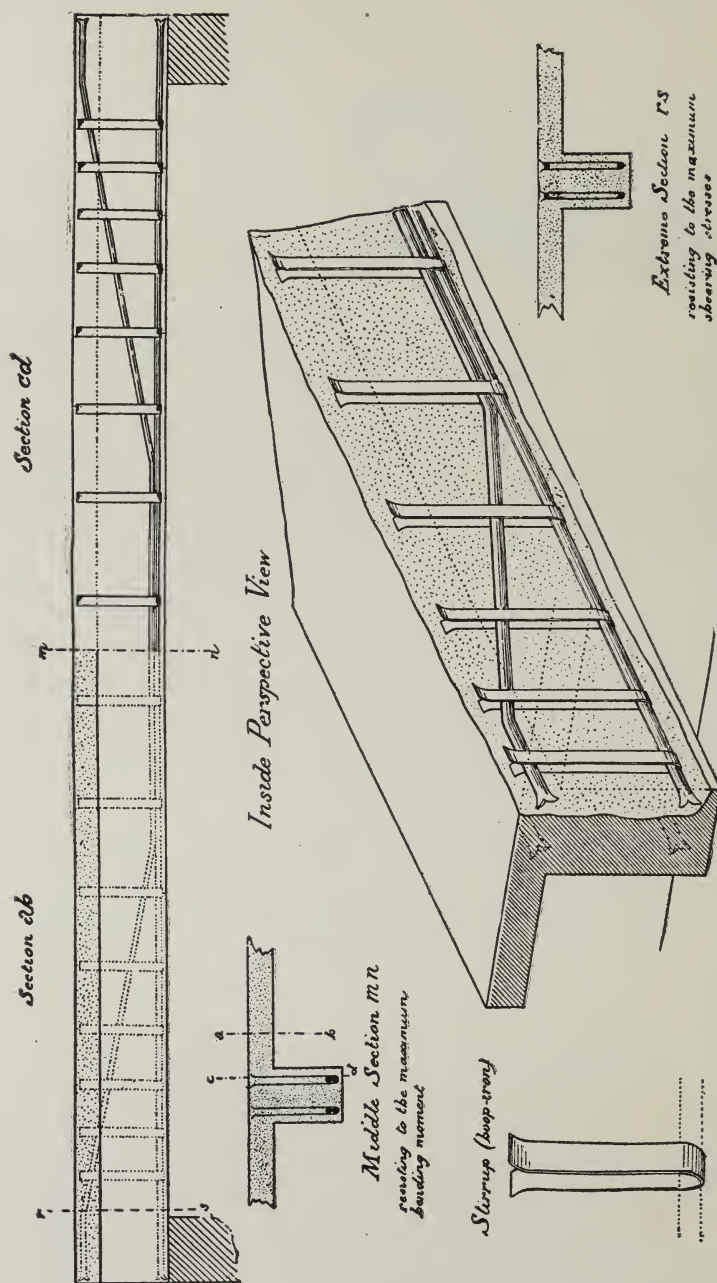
Concrete Beam and Girder Reinforcement. Hennebique System.
